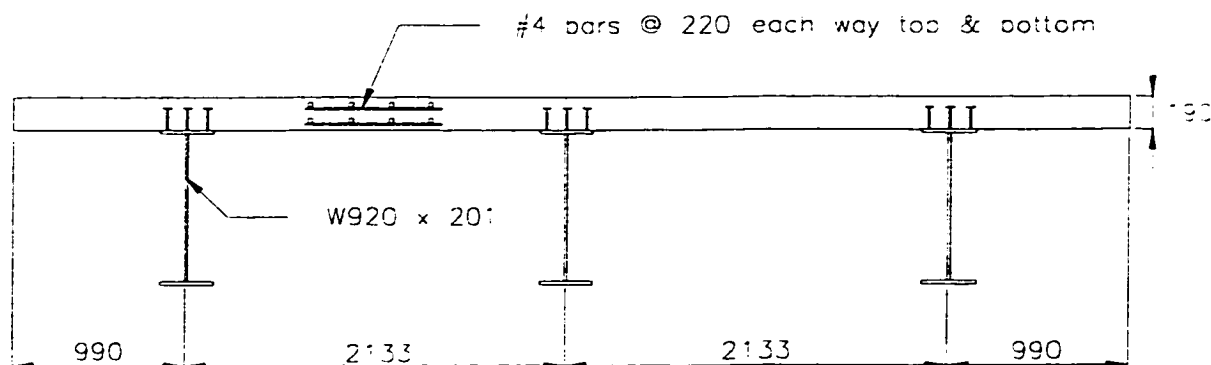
Isotropically reinforced bridge deck tested by Fang et al. (1986)
